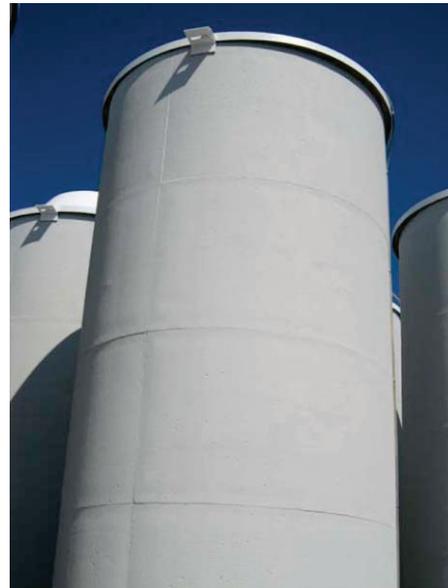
Coating Application for Waterproofing of Spent Fuel Canister
